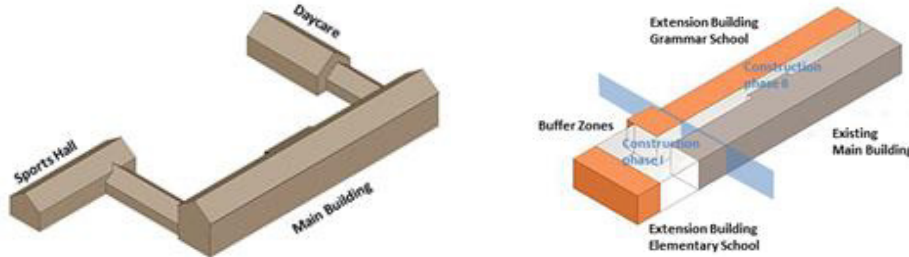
Model of the building complex before (left) and after retrofitting. The buildings Sports hall and Daycare are demolished due to bad state of construction. Source: IGEL
